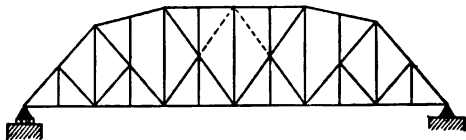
Sub-divided Pratt Truss with Inclined Top Chord commonly known as the Pettit Truss.
